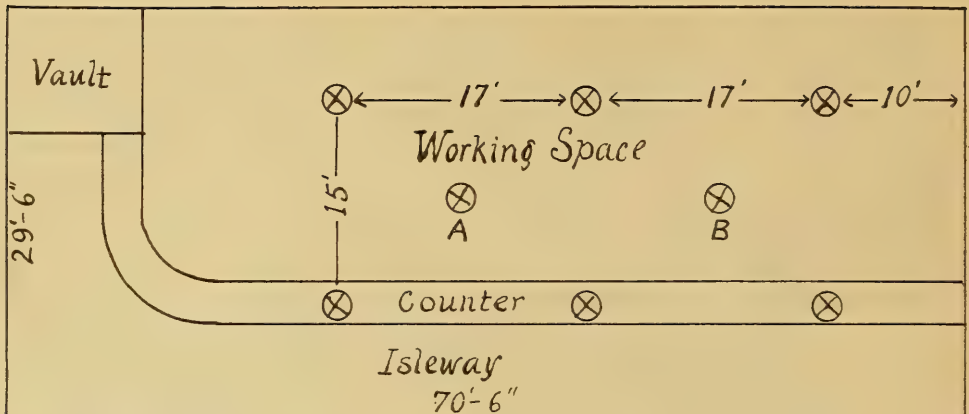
FLOOR PLAN OF OFFICE AND OUTLETS.
